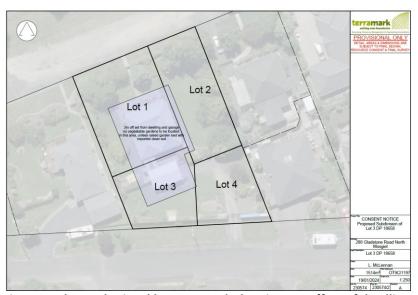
Plans submitted by Terramark showing 3m offset of dwelling and garage footprints
